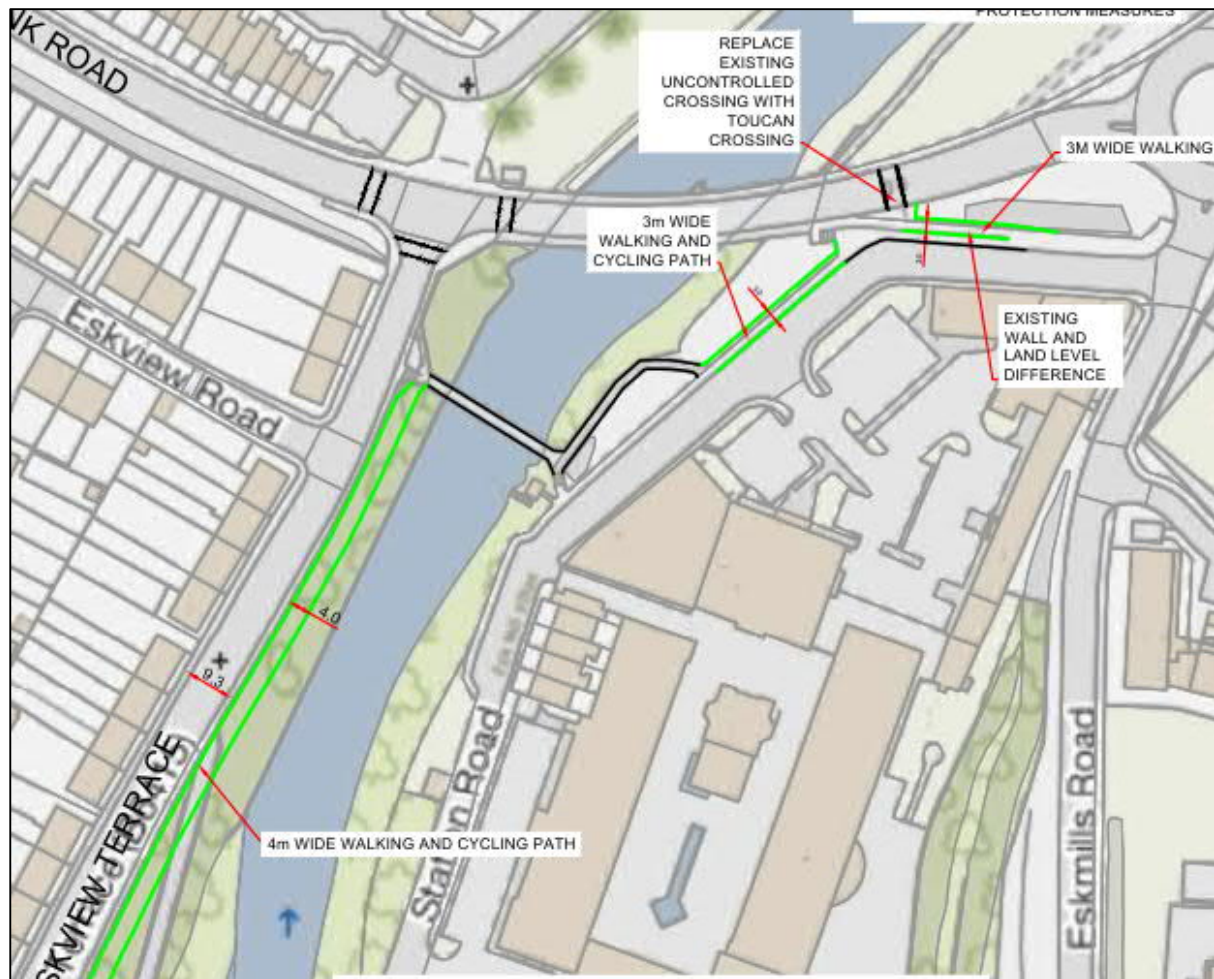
Route 5 Option A and B - Example of intervention (4m wide walking and cycling path on retaining wall in Haugh Park, new crossing across Olive Bank Road)
